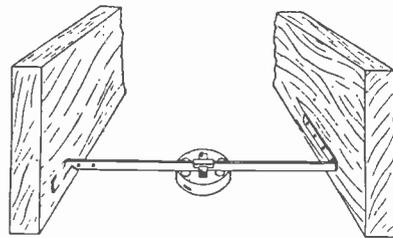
A metal bar or hanger is used to support outlet boxes between the joists.
